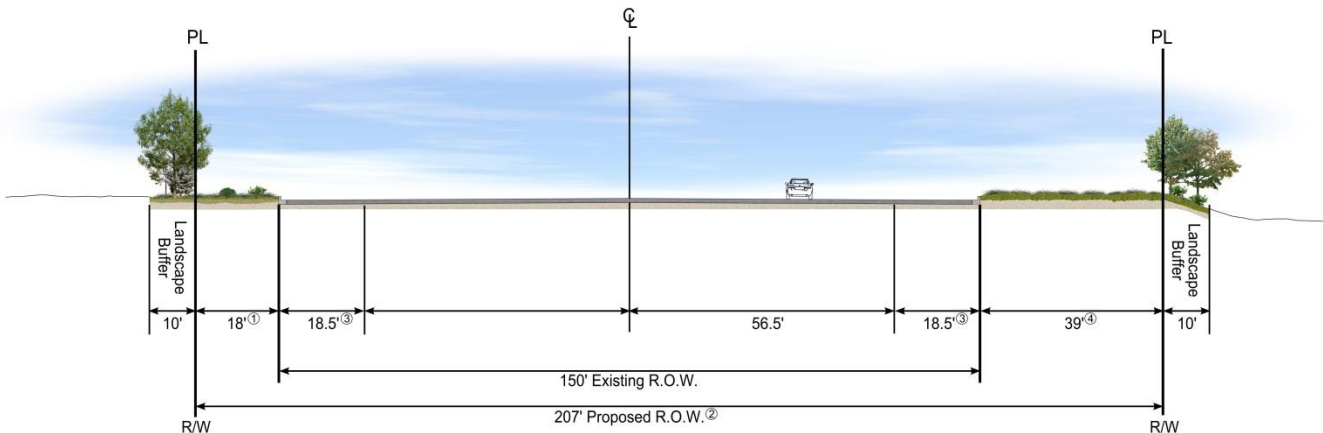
HIGHLAND RANCH PARKWAY CONCEPT DETAIL (Pyramid Way to Eastern Project Boundary)
